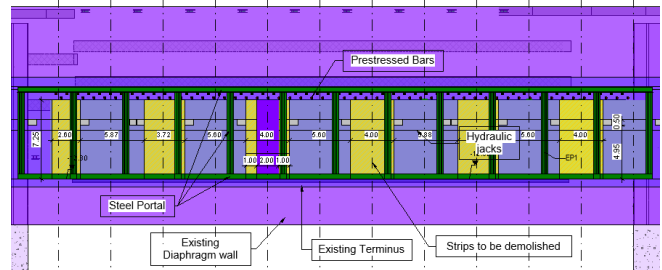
Elevated: Cut&Cover excavation, demolitions, and load transfer procedure solution.
